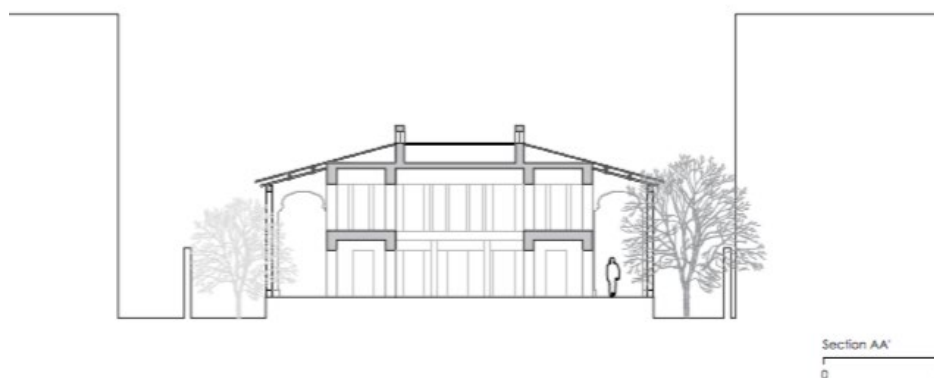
Bhagwandas Pavilion Section, Drawing by Ketham's Atelier Architects.
